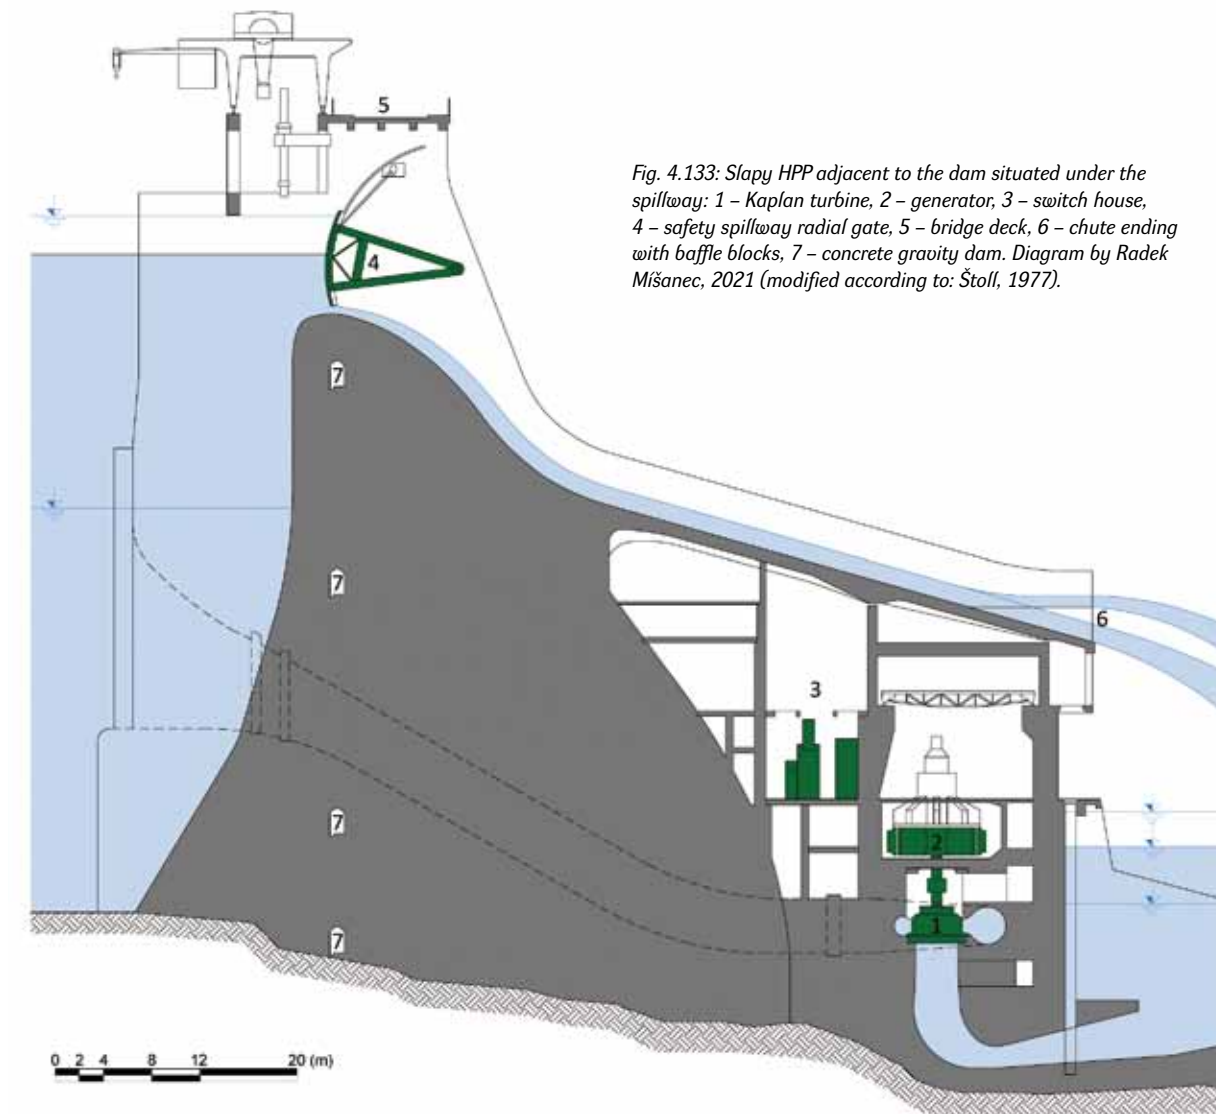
Slapy HPP adjacent to the dam situated under the spillway: 1 – Kaplan turbine, 2 – generator, 3 – switch house, 4 – safety spillway radial gate, 5 – bridge deck, 6 – chute ending with baffle blocks, 7 – concrete gravity dam. Diagram by Radek Mišanec, 2021 (modified according to: Štoll, 1977).
